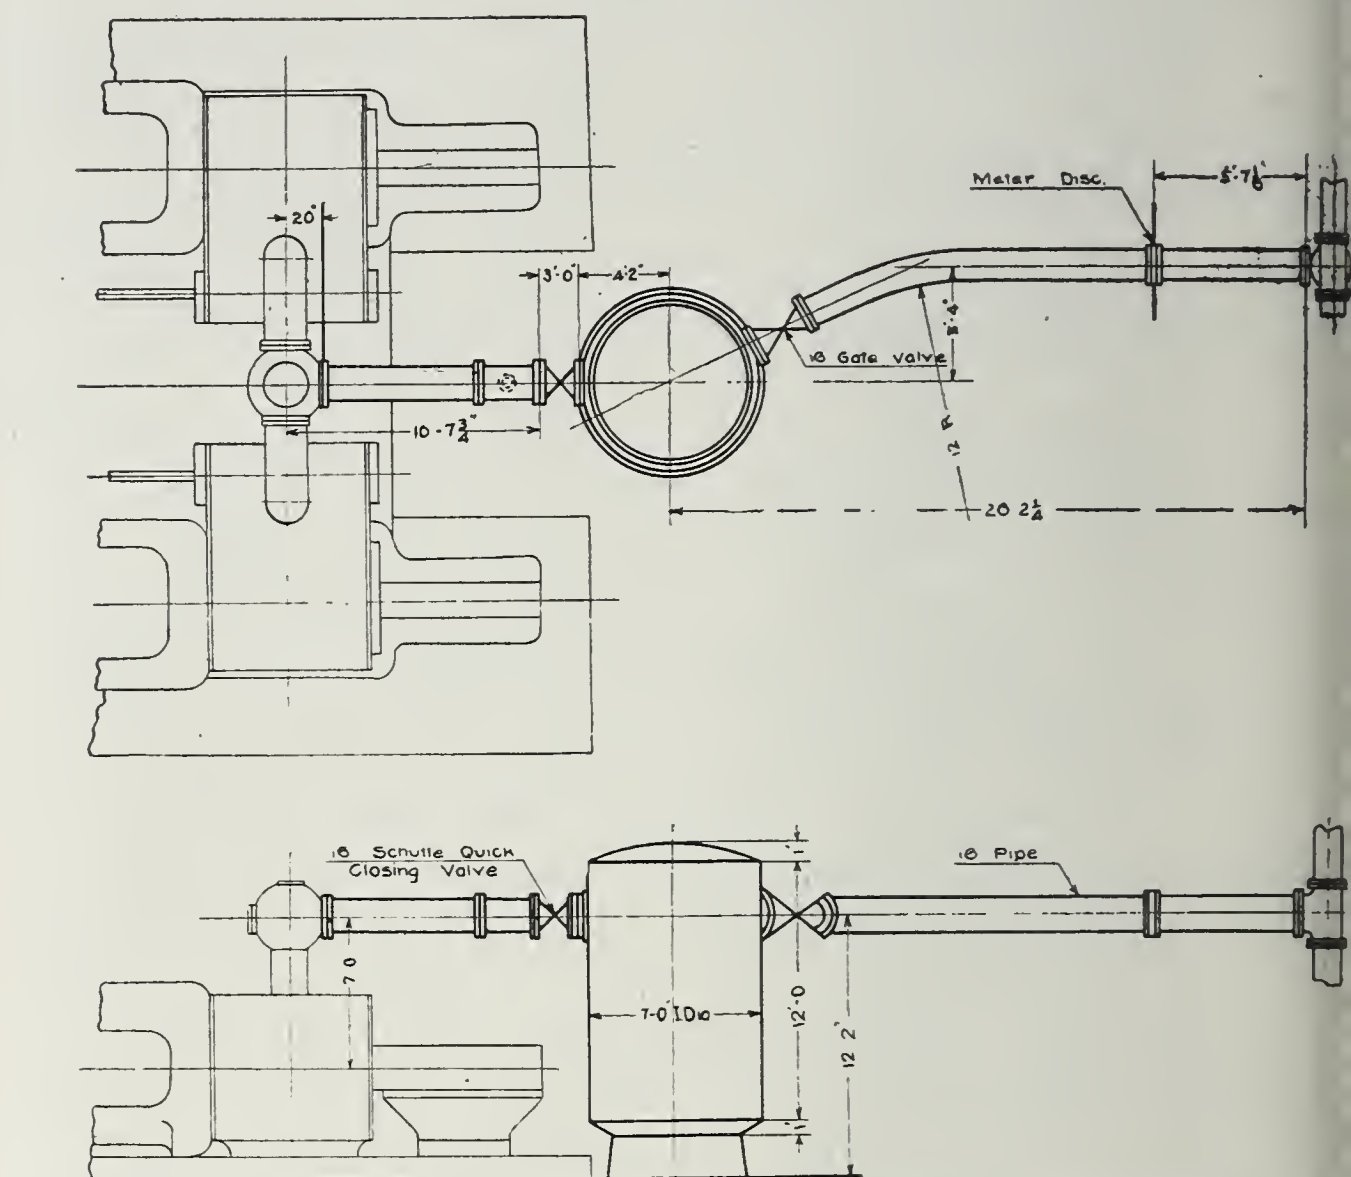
Steam Piping and Receiver Separator Arrangement.
